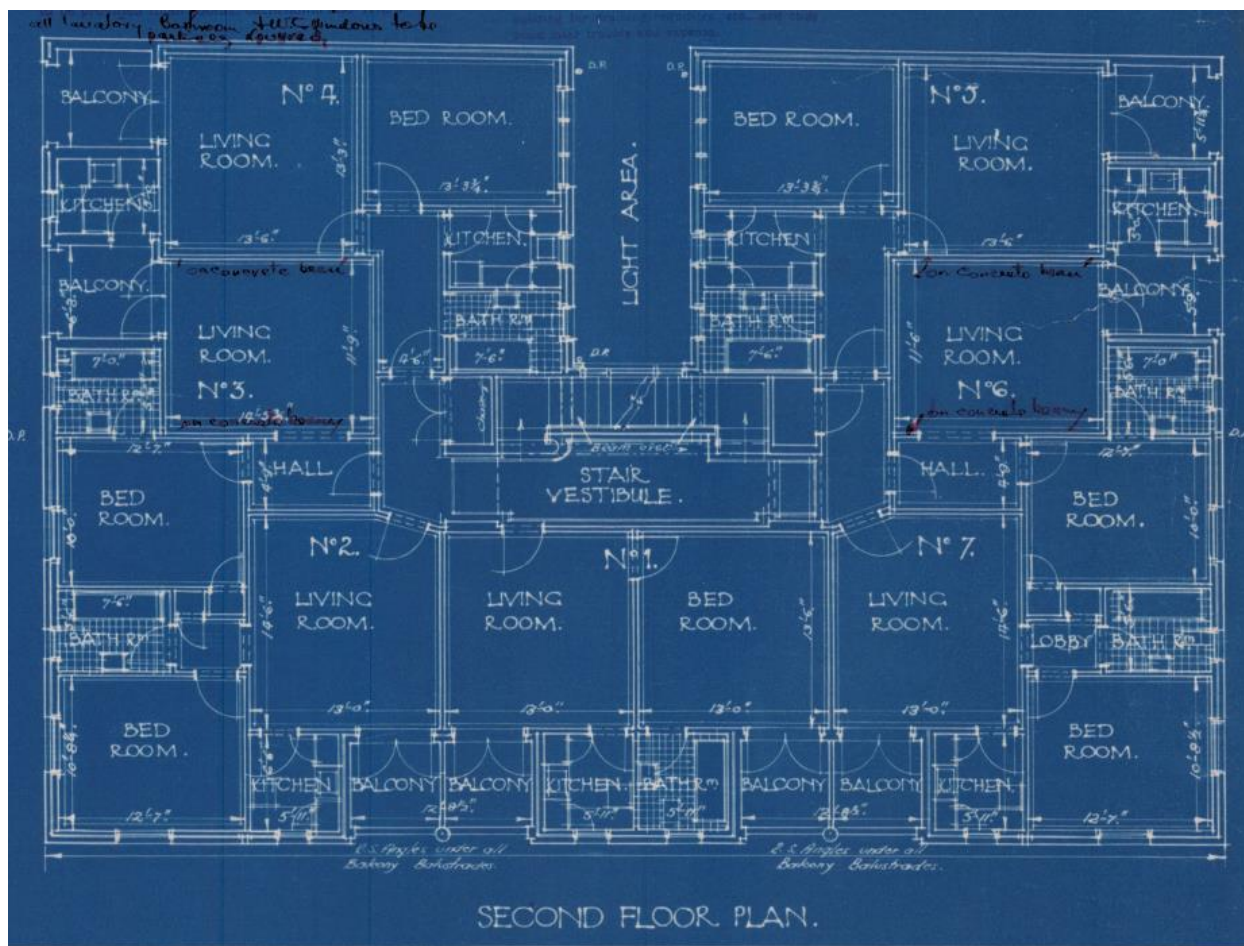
Original Level 2 floor plan of Wilkinson House, 1926.
